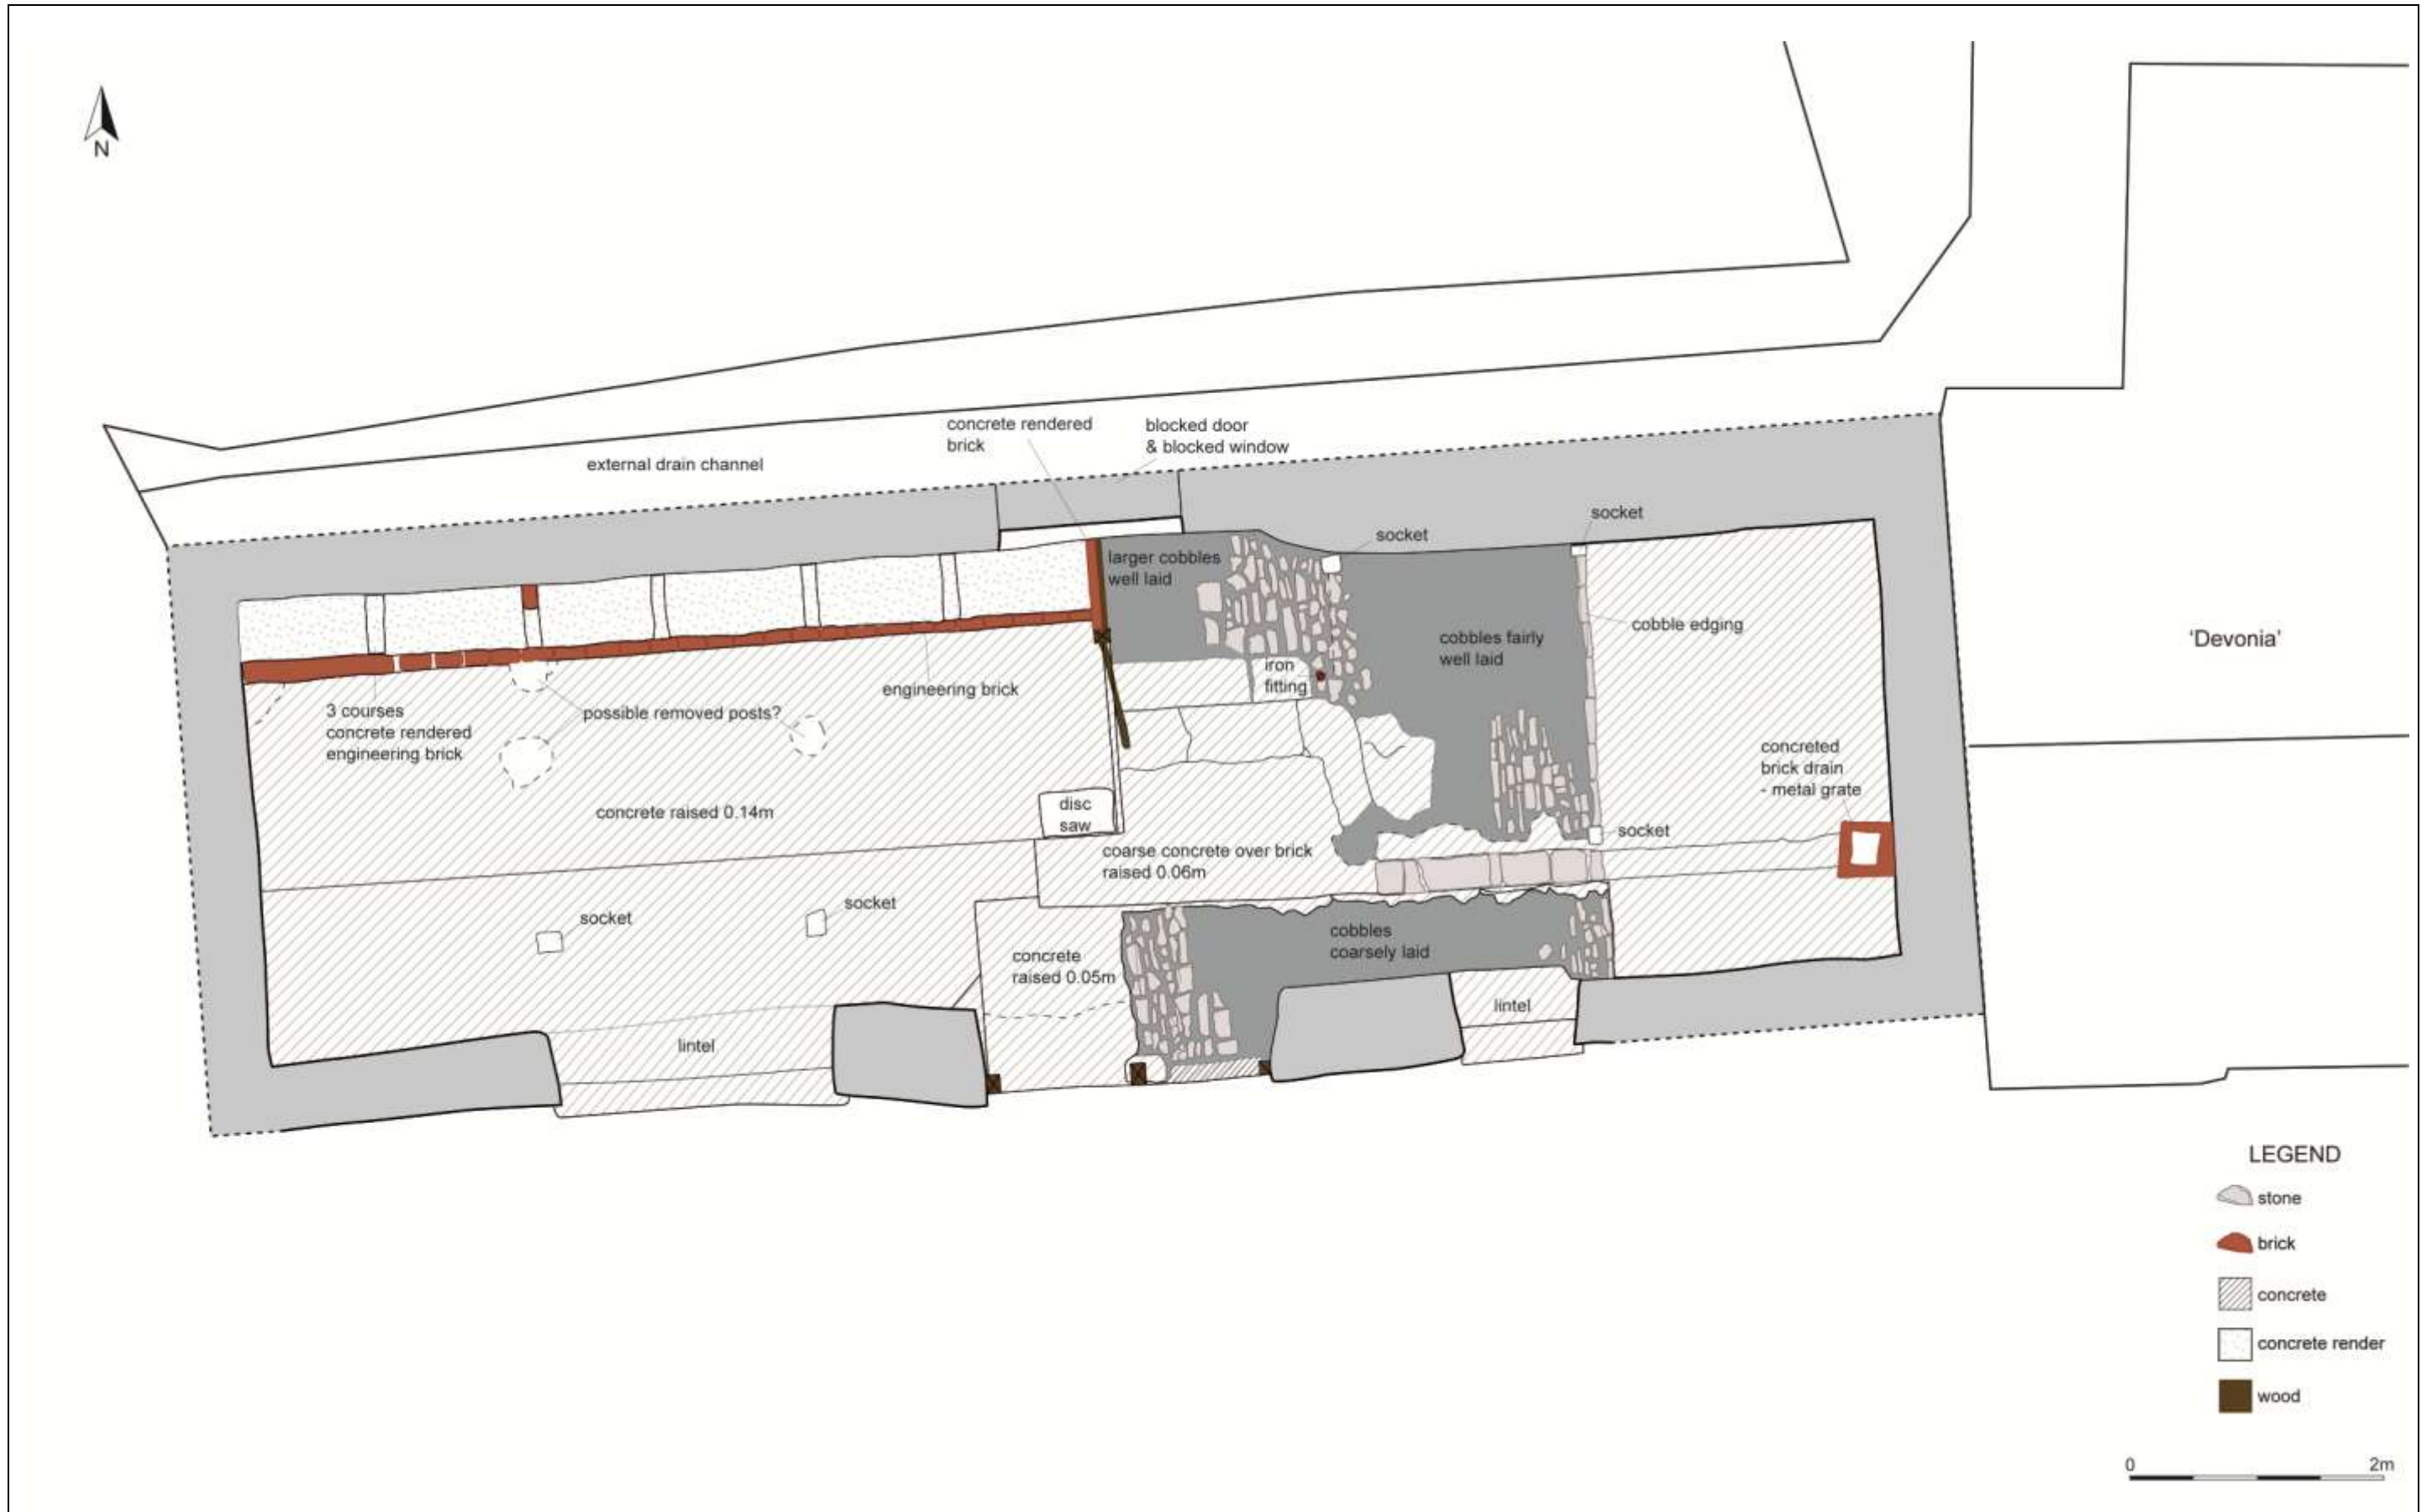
PLAN OF B1 SHOWING DETAIL OF CONSTRUCTION AND FEATURES.
